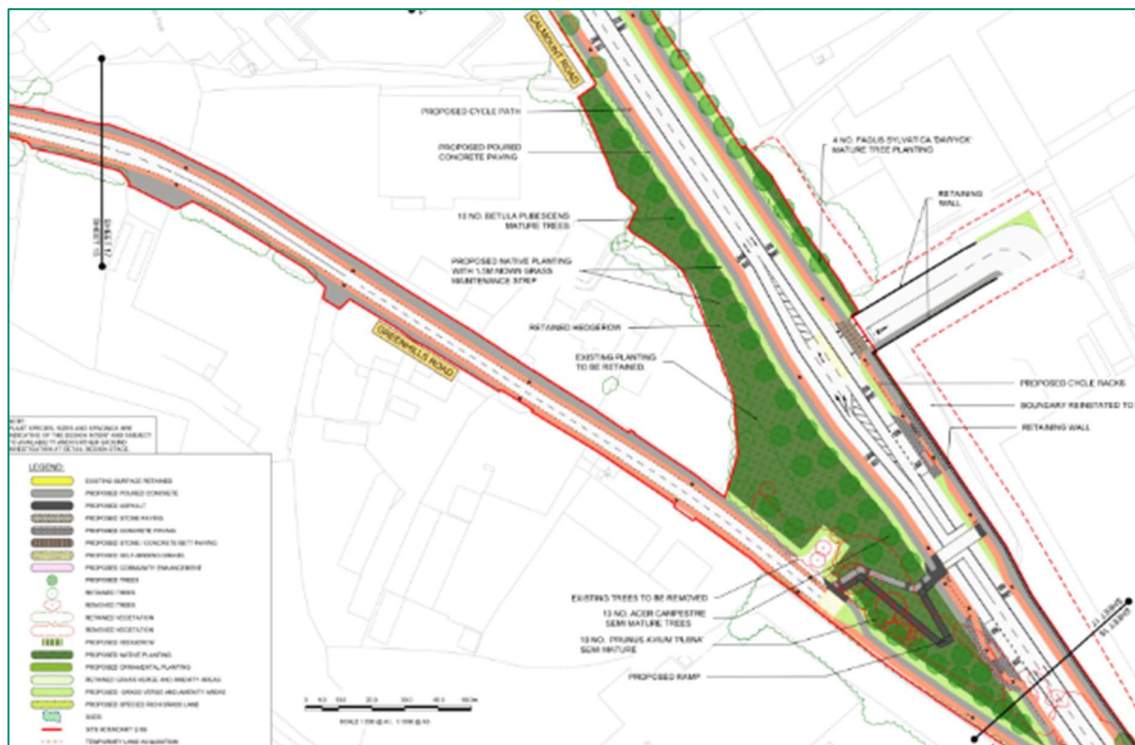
Extract of Landscaping General Arrangement Drawings between the extended Calmount Road and existing Greenhills Road
